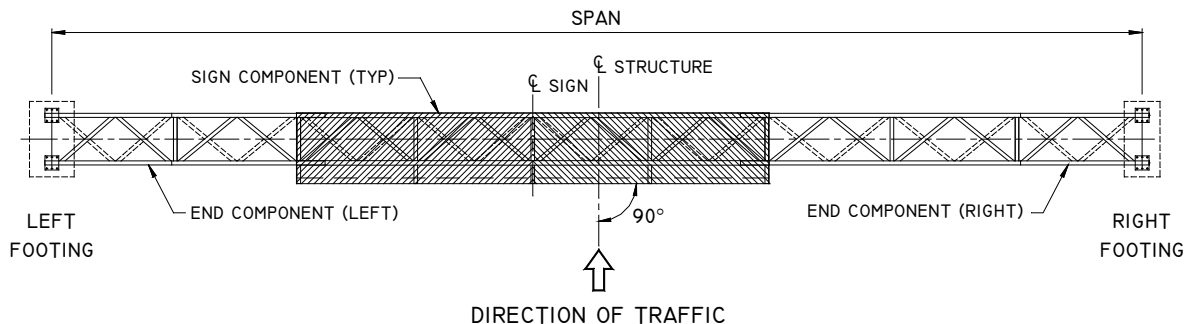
(a) TYPICAL VMS OVERHEAD TRUSS LAYOUT PLAN
